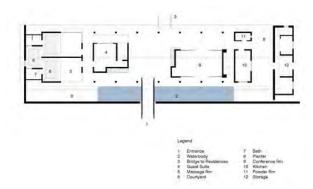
Plan, Source: http://www.archdaily.com/376950/think-tank-retreat-rma-architects
